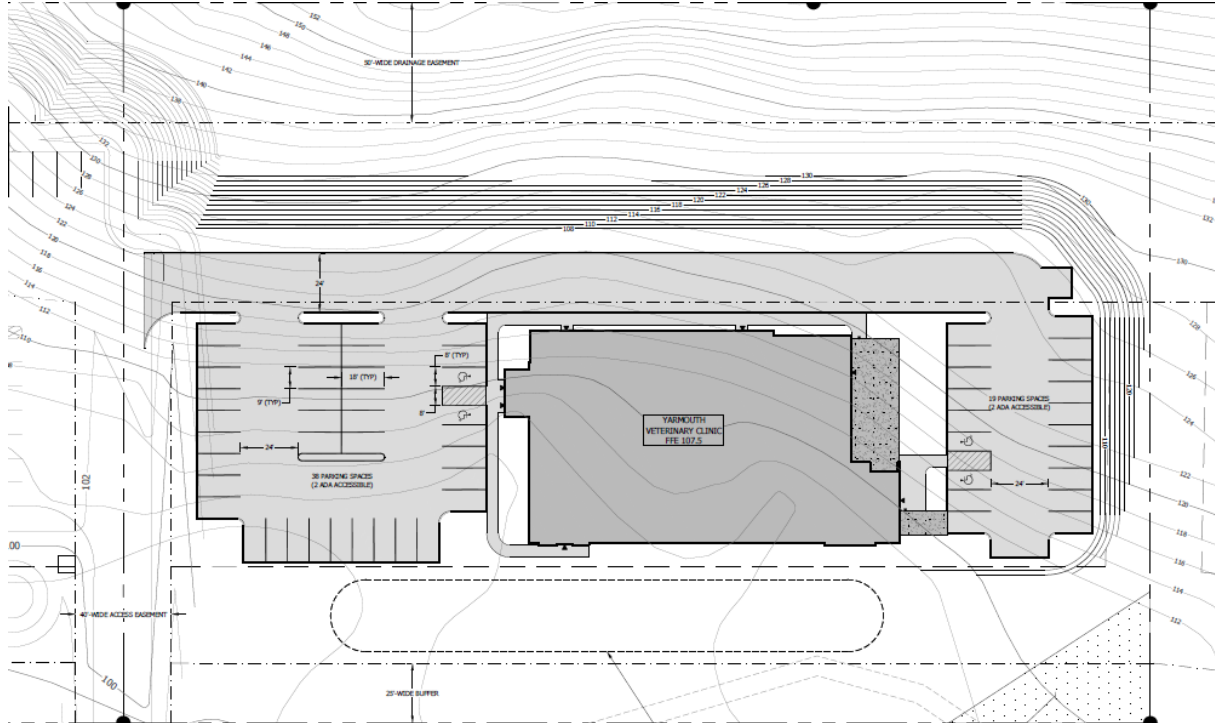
Preliminary Site Plans - initial site plan developed by Sevee & Maher including separate client (Eastern) and staff (Western) parking lots.
